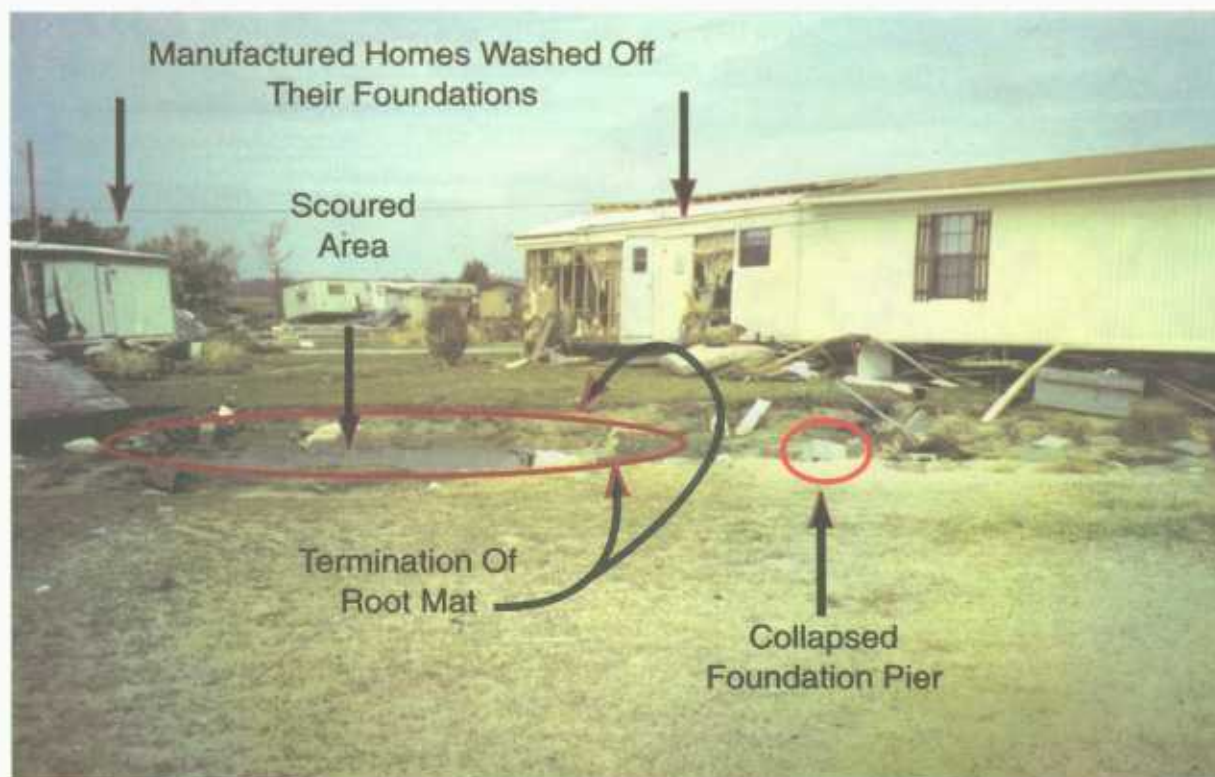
Localized scour beneath pre-storm footprint of manufactured home. Note the collapsed dry-stack block foundation and termination of root mat, which otherwise would have helped stabilize the adjacent ground.
